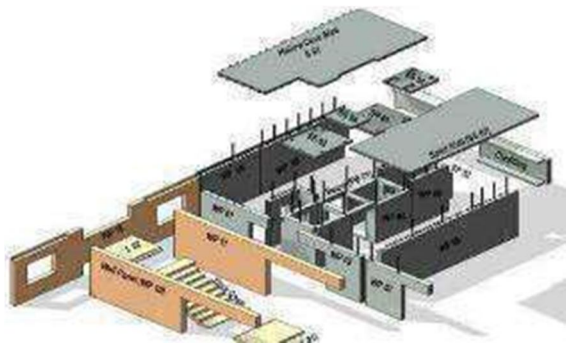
Precast Concrete Structural Elements for a Typical Residential Unit
